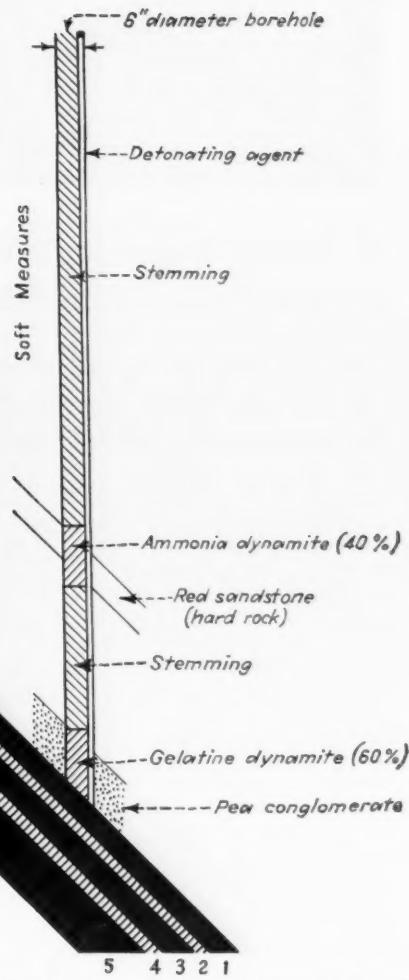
Cross-section of bottom of borehole showing bed. charges of explosive and stemming.
